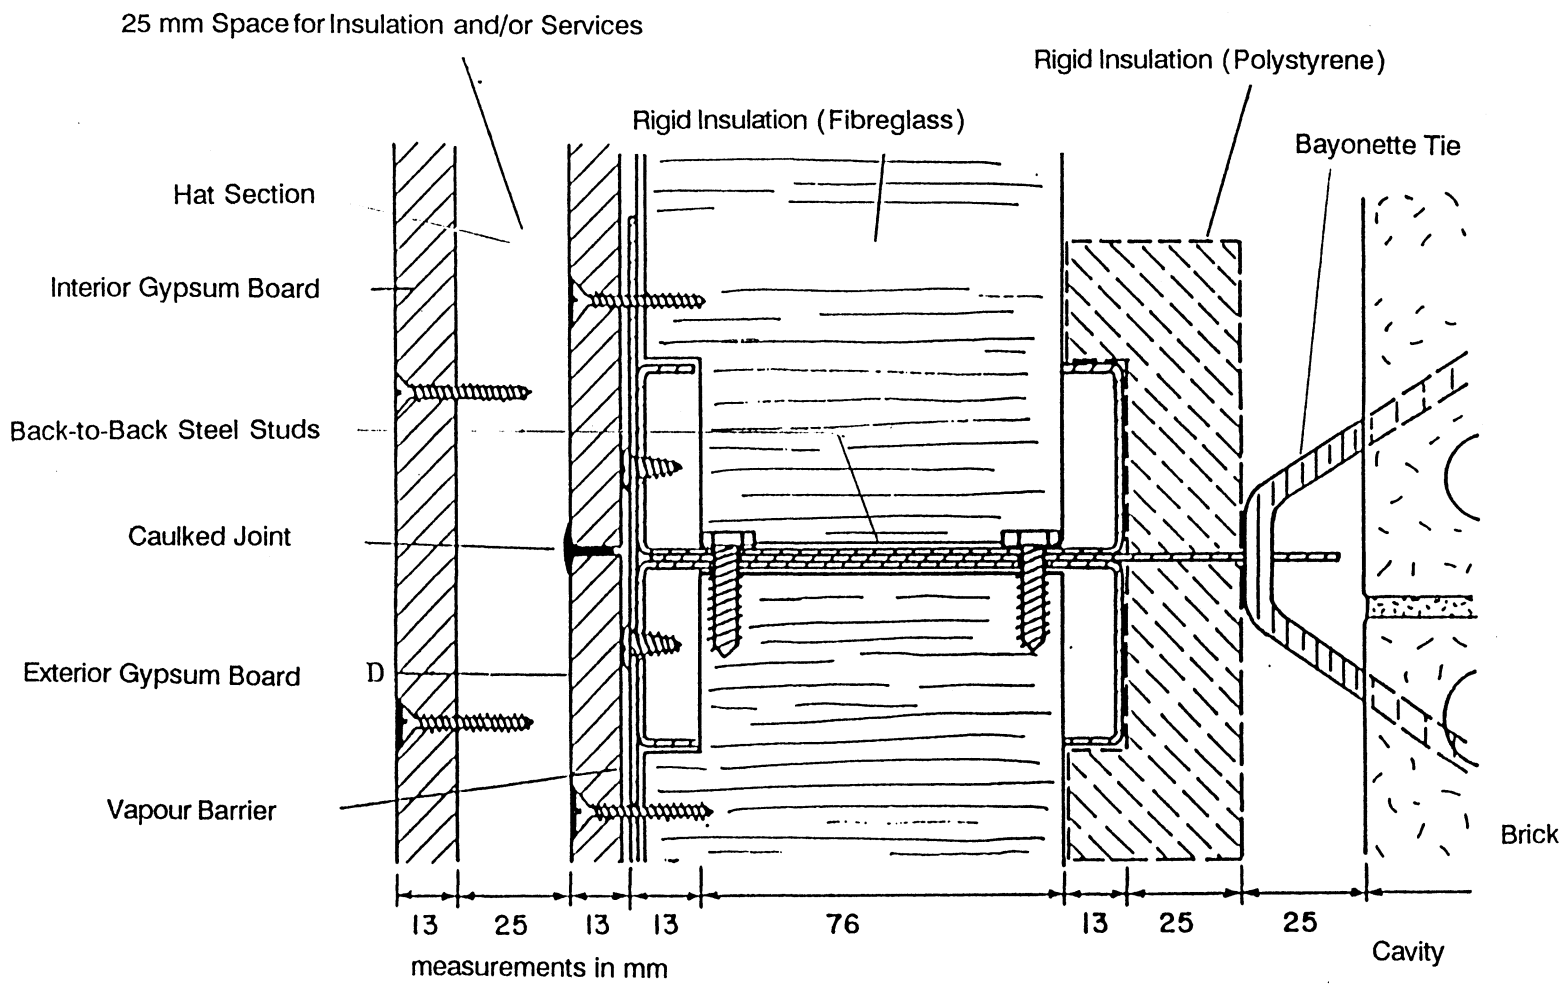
Horizontal Section Showing Tie and Thermal Insulation Features of Wall Type 3
